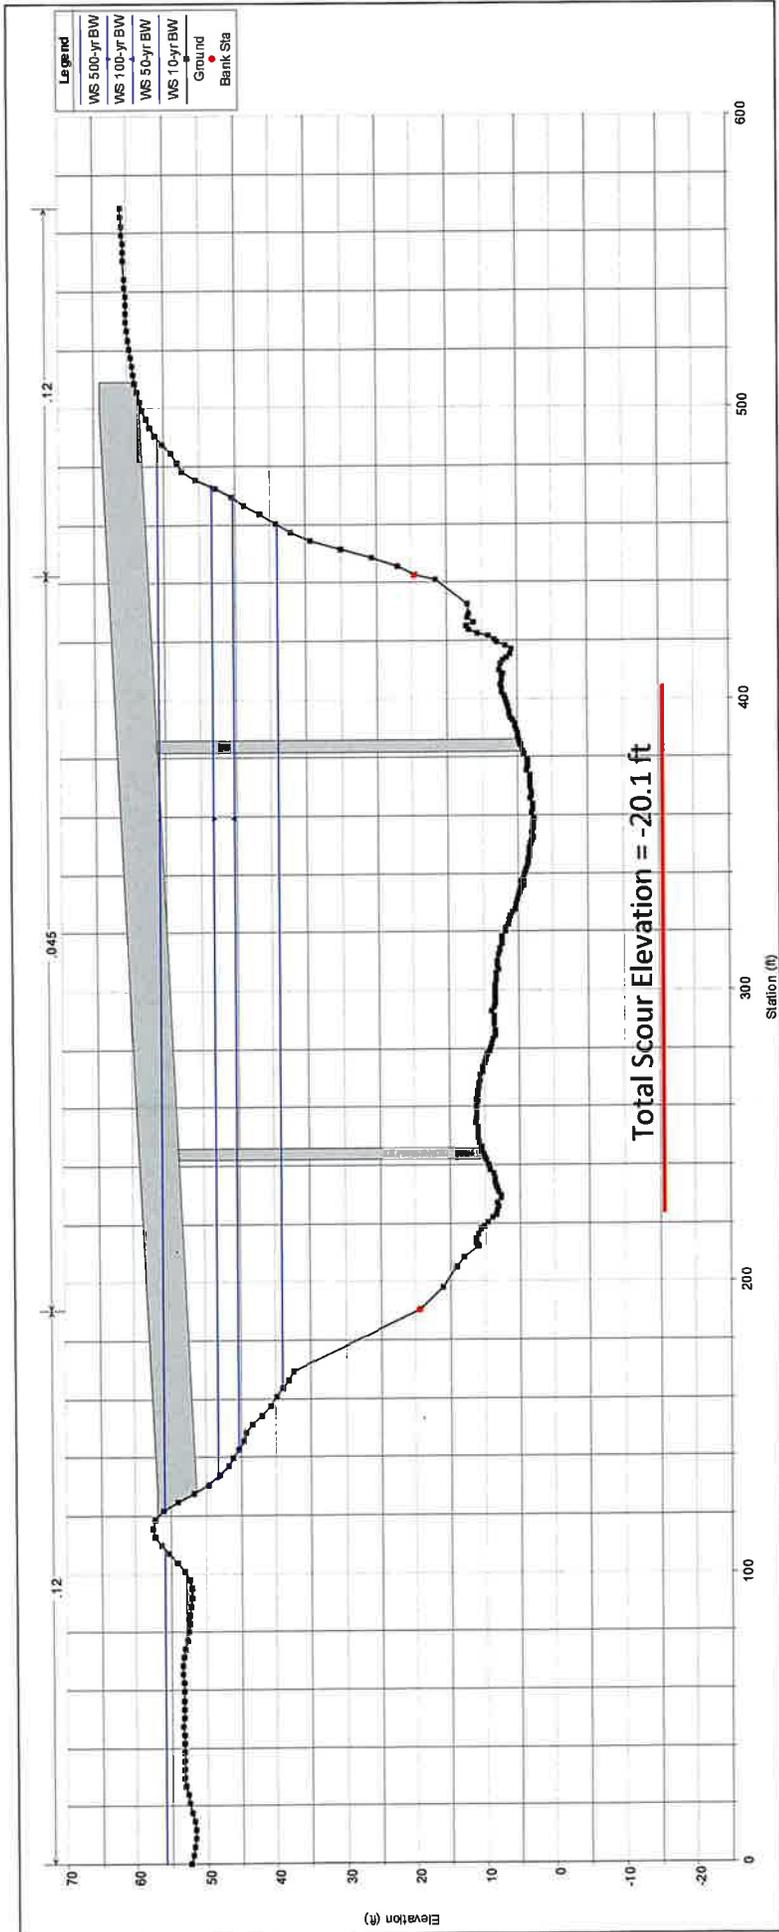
Scour Elevation for Alternative 2/3/5 at Upstream Face
